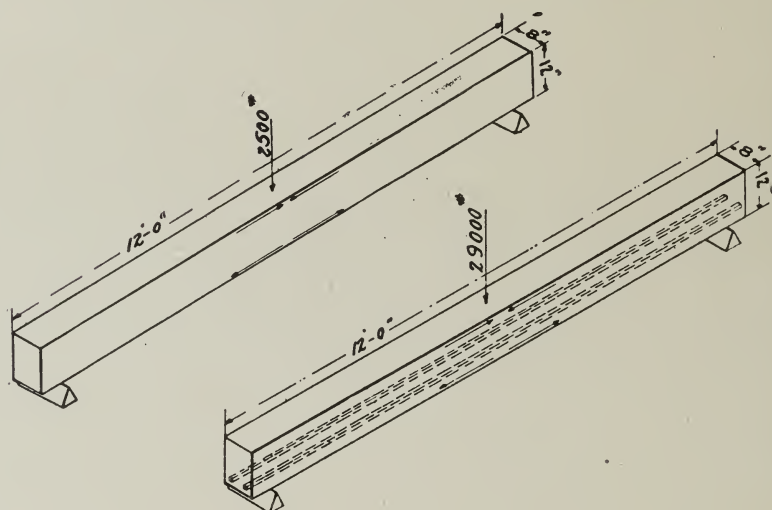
Comparative Strength of Plain and Reinforced Concrete Beams.
